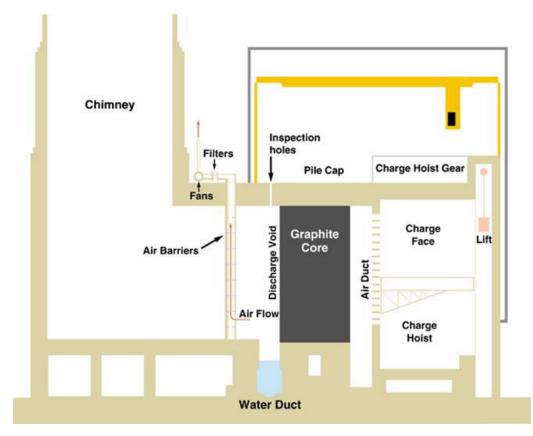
Cross-section through Windscale pile 1 structure.
